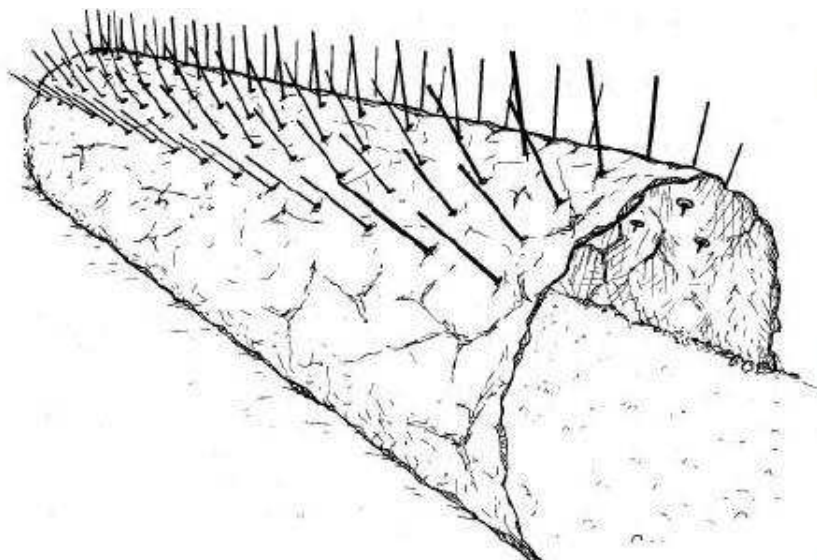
Systematic bolting in tunnel roof [Norconsult, 2009].
